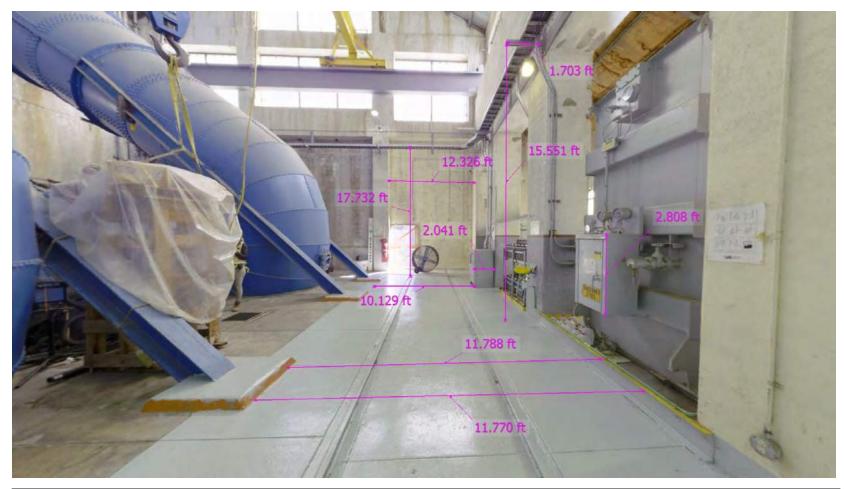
Width of corridor between concrete pedestal to point between columns 10 & 11. Cable Tray Height measurement and support measurement. Corridor width between pedestal and electrical box (Column 12). Electrical Box Width (Column 12). East Wall potential opening measurement
